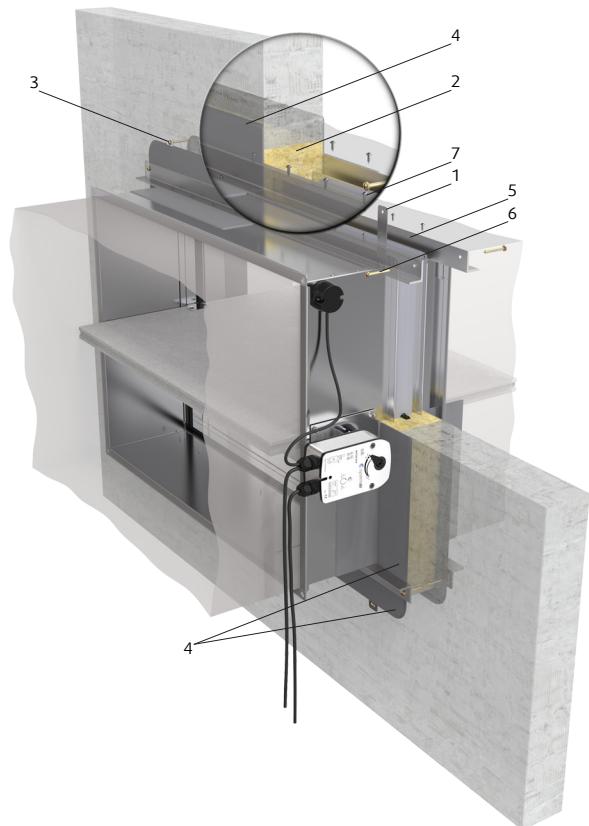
Installation of a rectangular fire damper PKIS into a soft crossing
